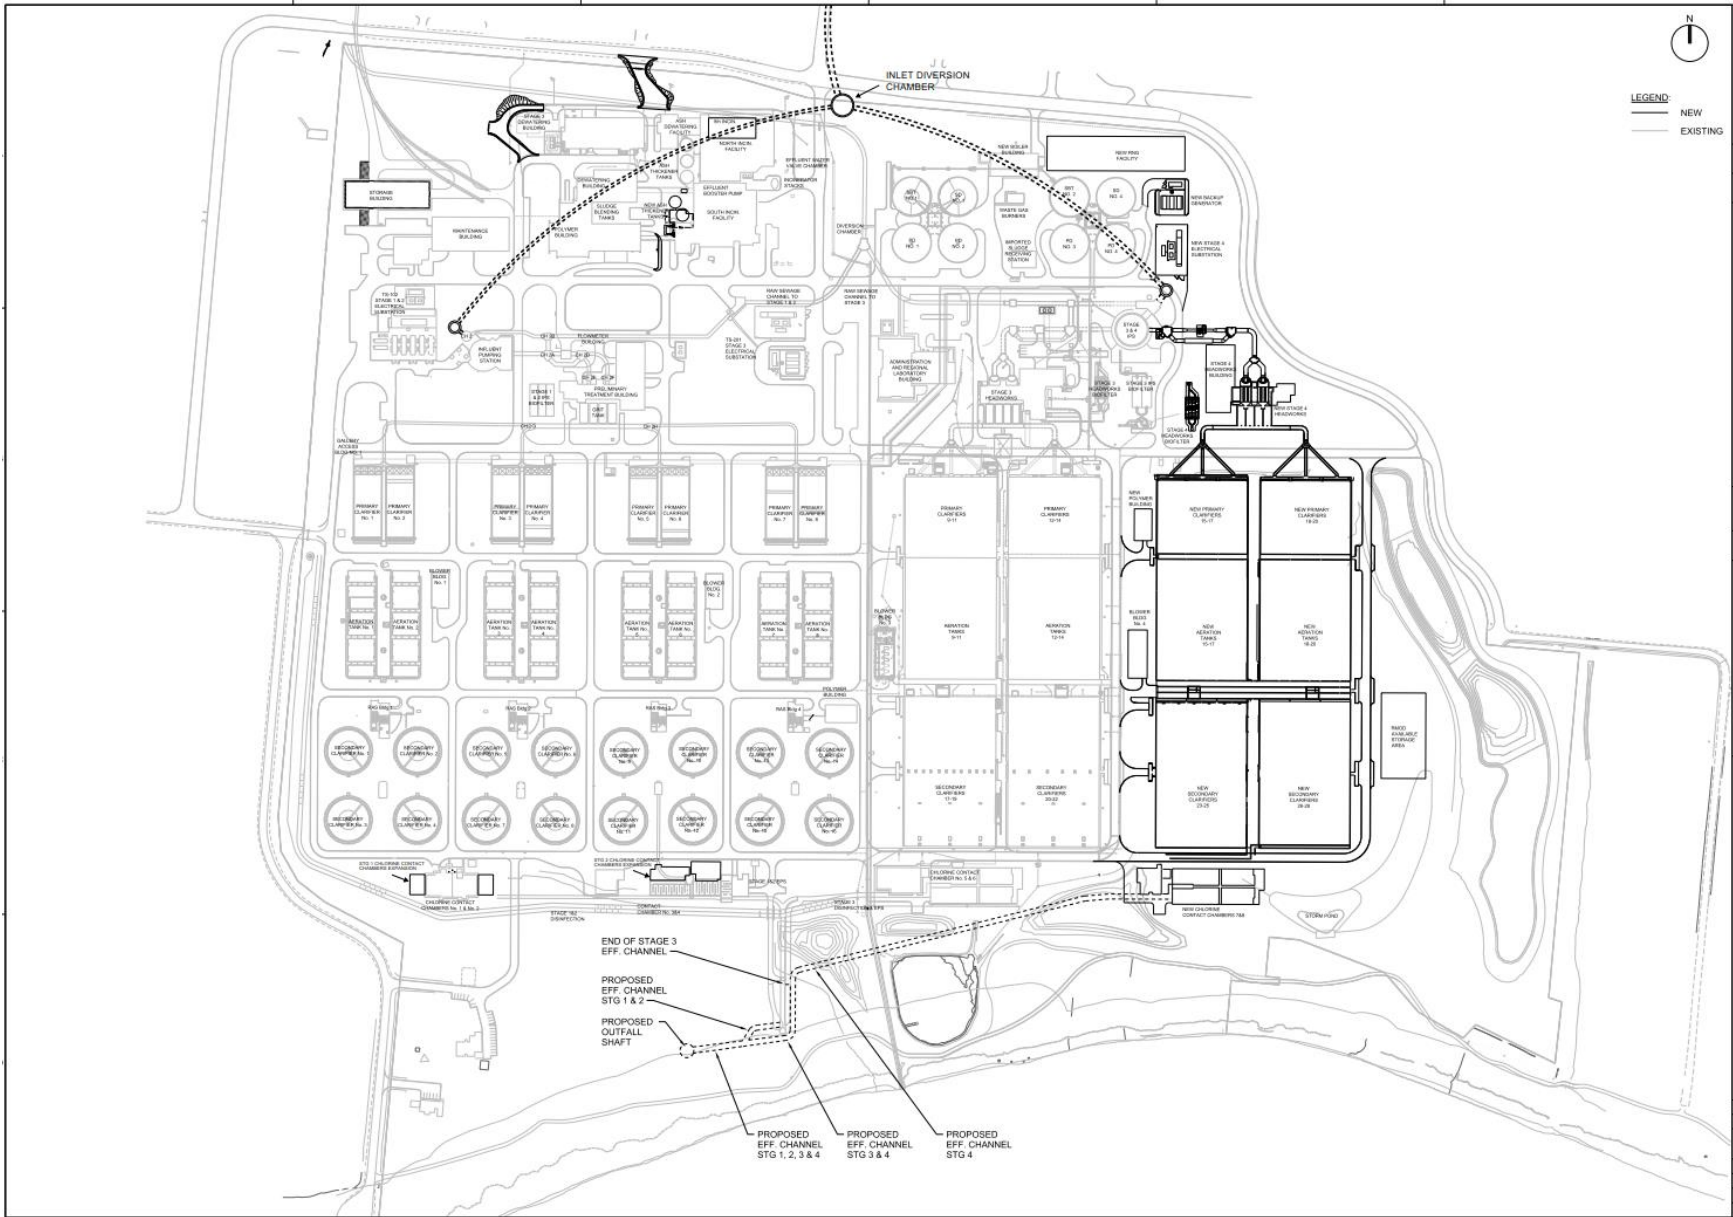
Duffin Creek WPCP Site Layout for the Plant Capacity Expansion
